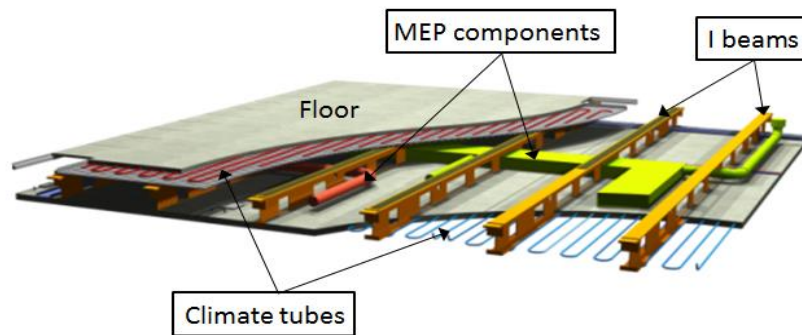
Slimline Floor Framing System Overall Design("Slimline Buildings Construction," 2014)
